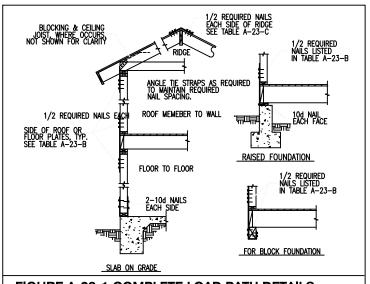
COMPLETE LOAD PATH DETAILS
